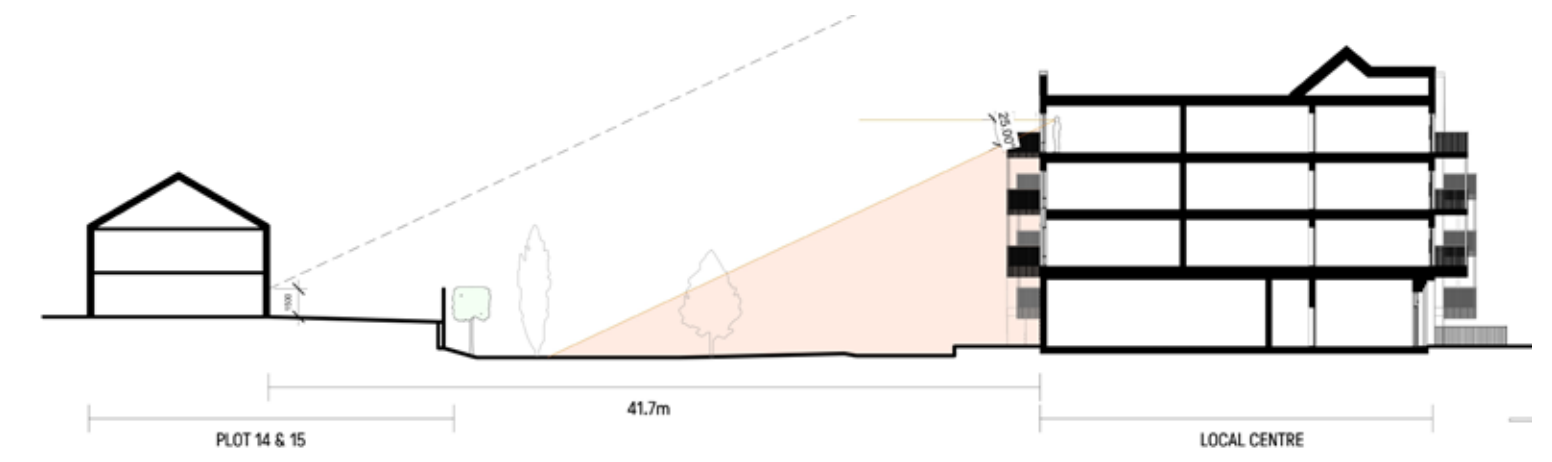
Local Centre & Plot 14 & 15 Third Floor Privacy Section post Design Workshop/Update
